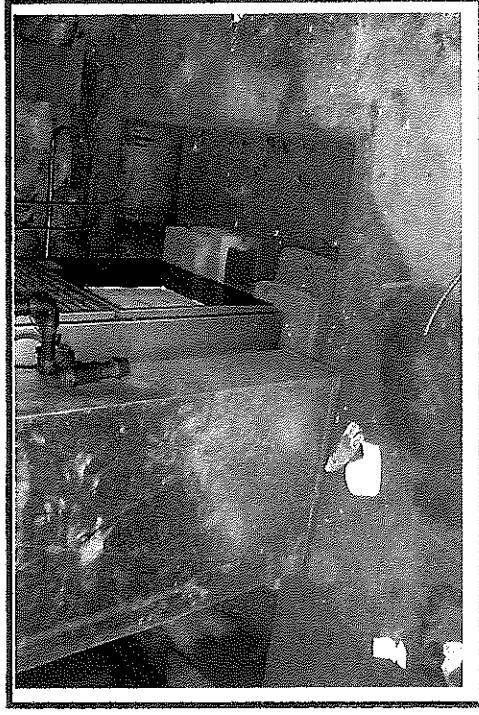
Air conditioning compressor in a pit in the basement of 108 N. 7th Street.
